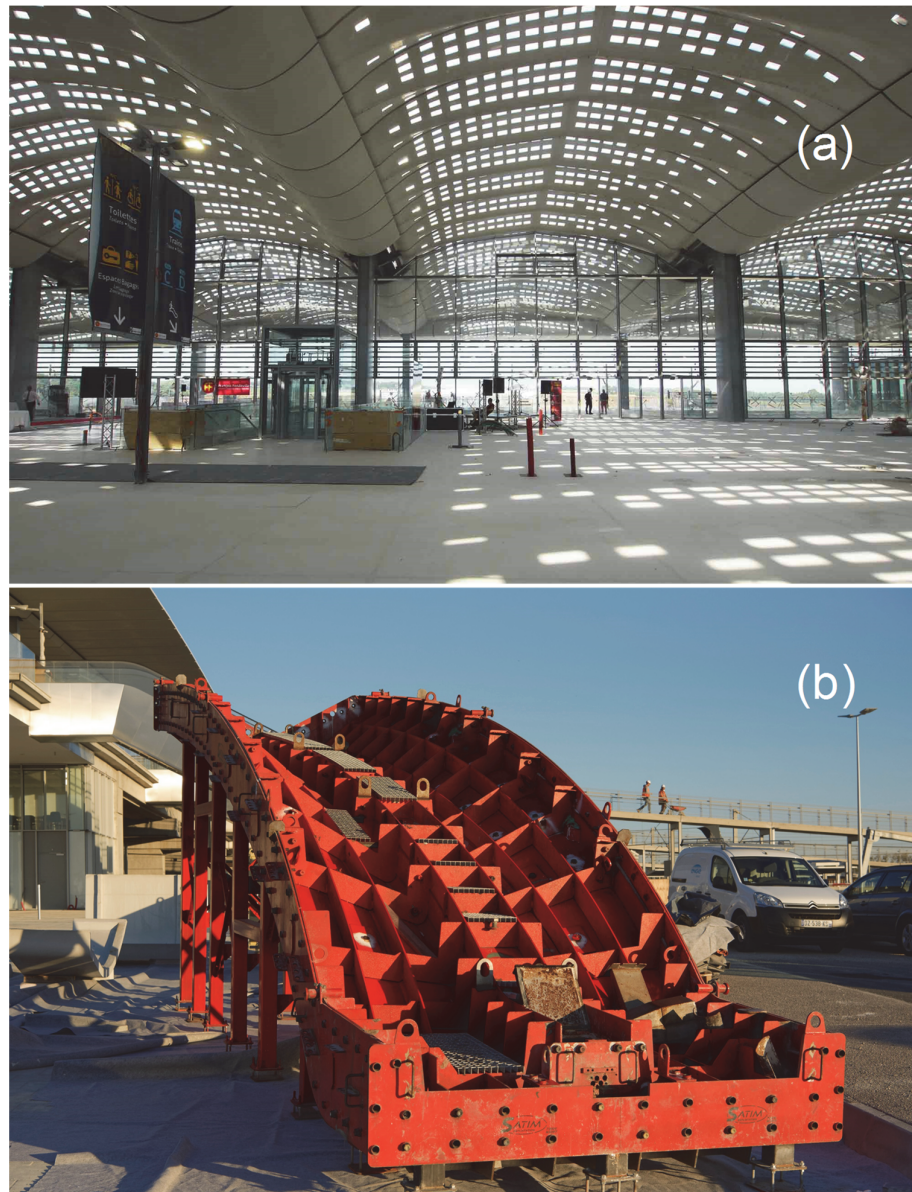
a) the roof of the Montpellier TGV station in France. The 5000m² roofing system consisted of 115 post tensioned modular elements called “palms”, each with dimensions 24 m x 2.4 m x 3 m, b) mold for the casting of a single palm element, photos E. Denarié.
